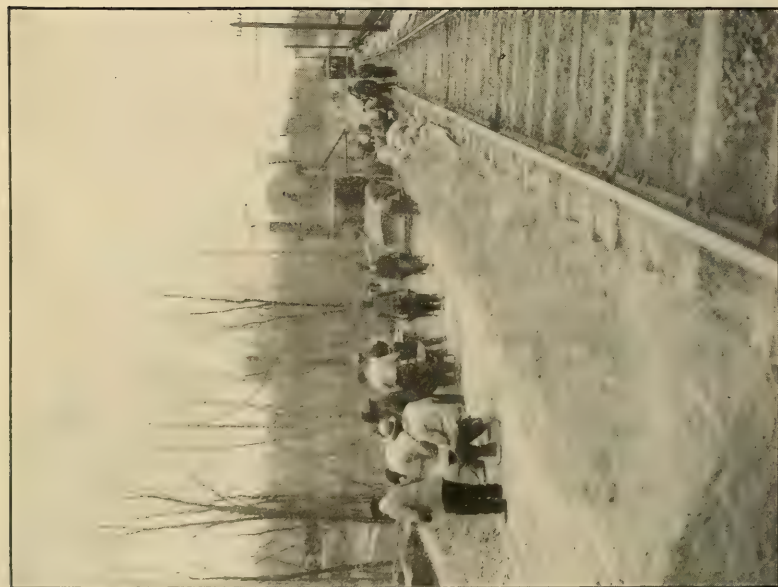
MIXING CONCRETE FOR THE FOUNDATION.
